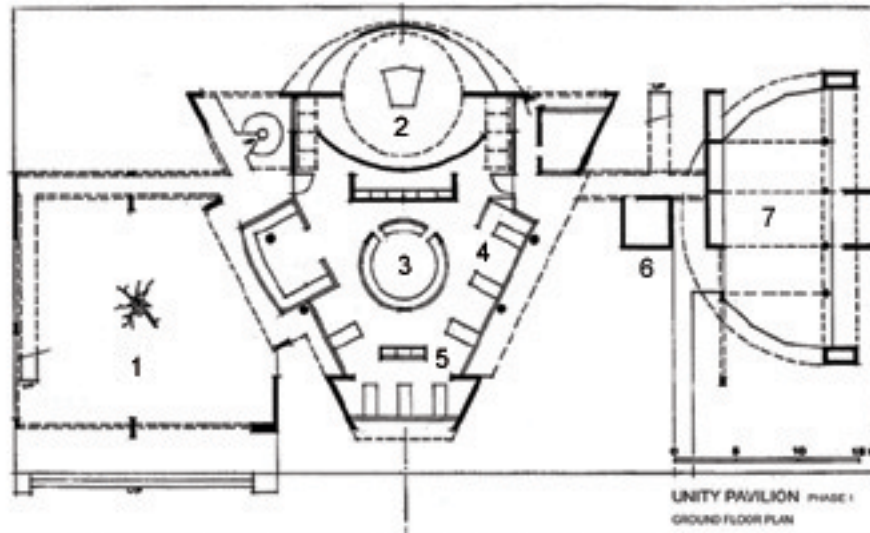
Unity Pavilion : Ground Floor Plan (1. Entrance Plaza, 2. Hall of Peace, 3. Internet, 4. Work Stations, 5. Planning, 6. Utilities, 7. Offices)
